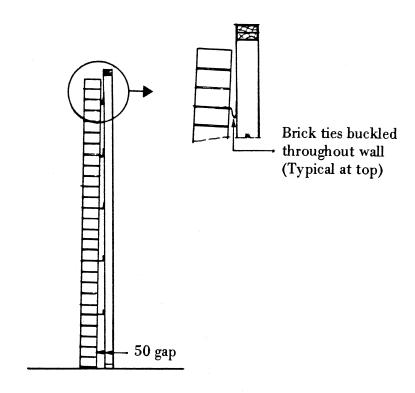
Brickwork failure by Rigid Body Rotation
